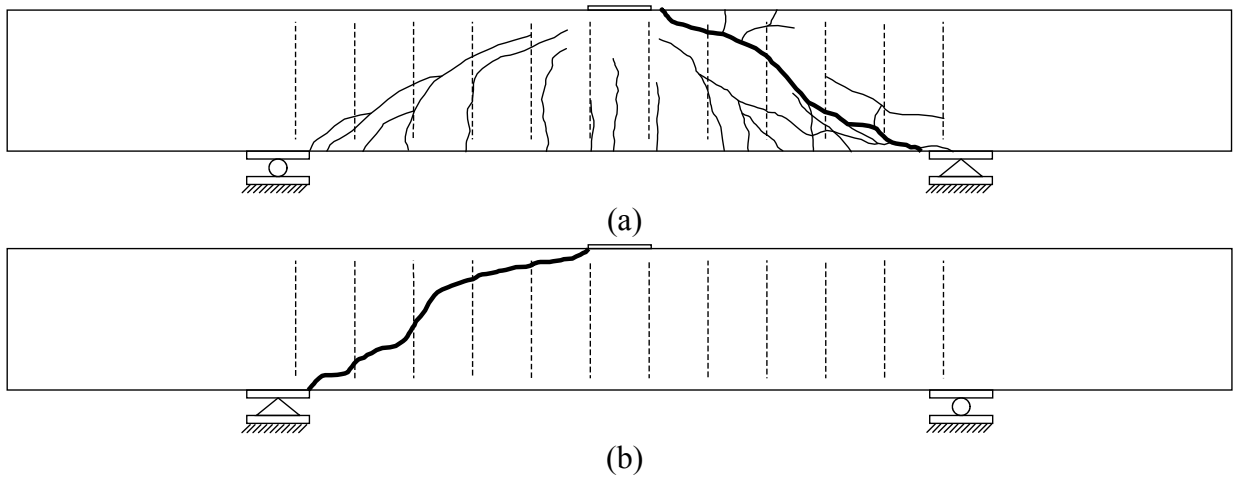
Observed damage in specimen P2S4, (a) front side, (b) back side
